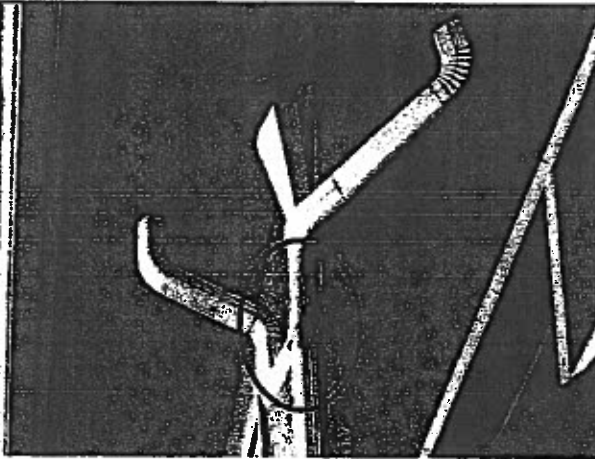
Unit #303 North elevation: note plant growth in convergence of downspouts.
